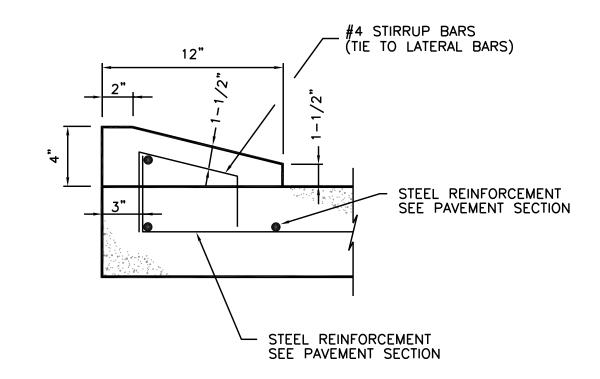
DETAIL - CONSTRUCTION JOINT SCALE: 1" = 0.5'
